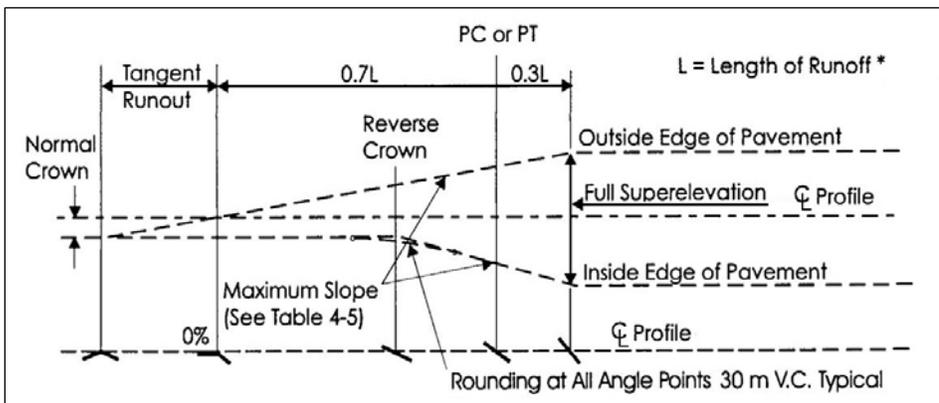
12: Superelevation Geometry – Pavement Revolved About Centerline
